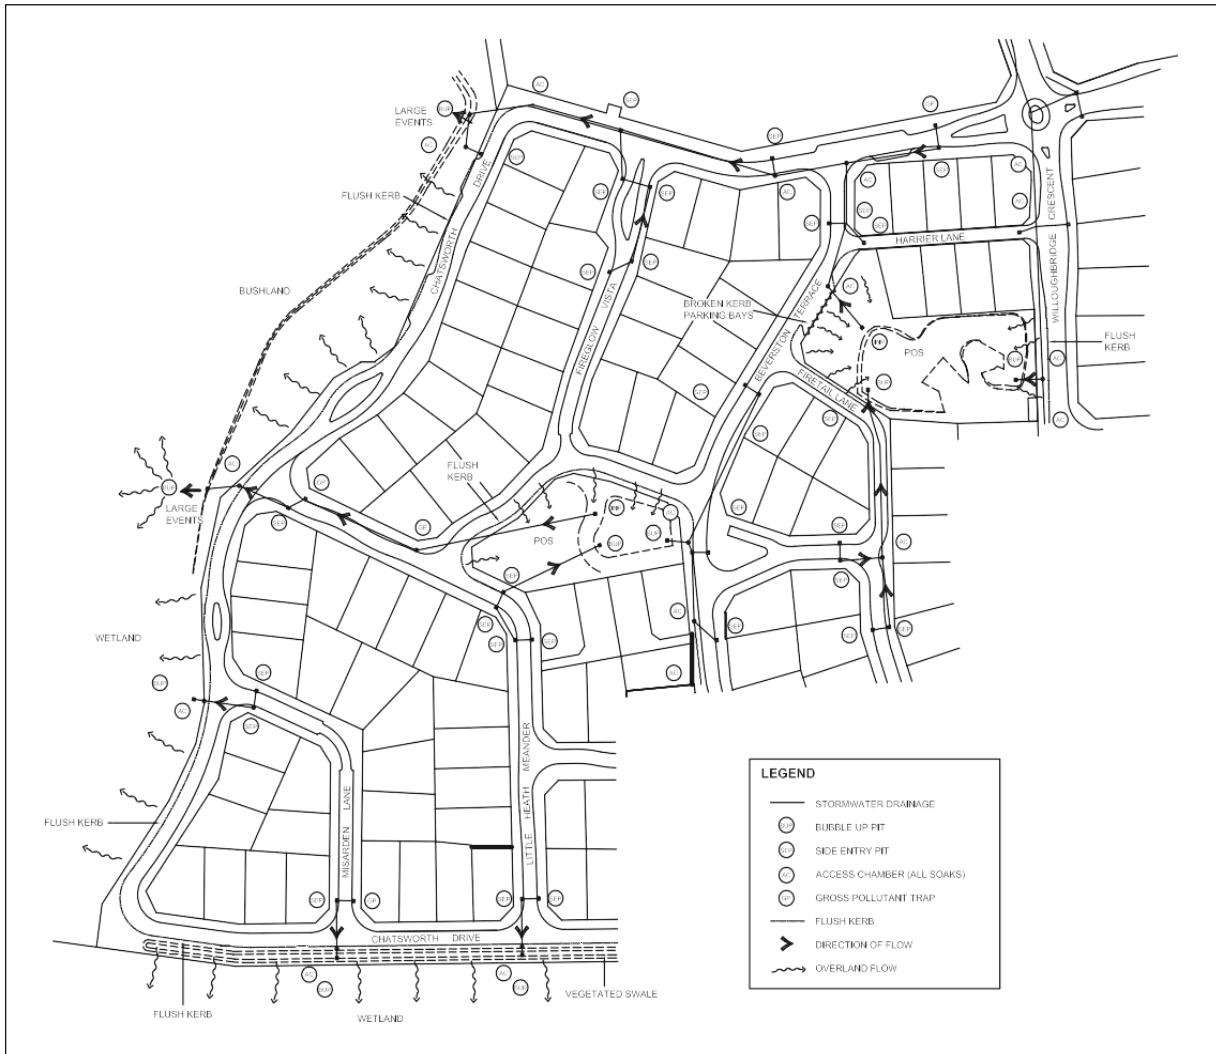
Drainage plan for Bridgewater South Estate inline storage and treatment system. (Source: Department of Water).
